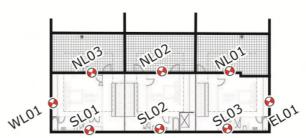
Opening Locations and Internal Apartment Layout - Level 29
